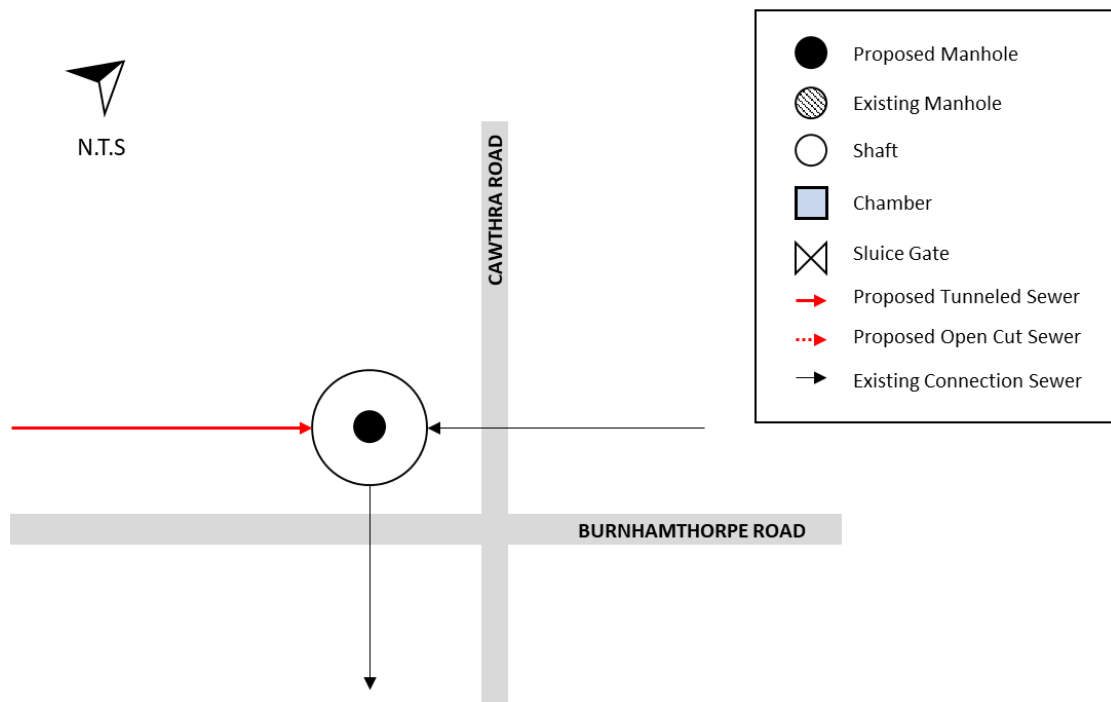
Burnhamthorpe Road and Cawthra Road Connection Type Schematic
